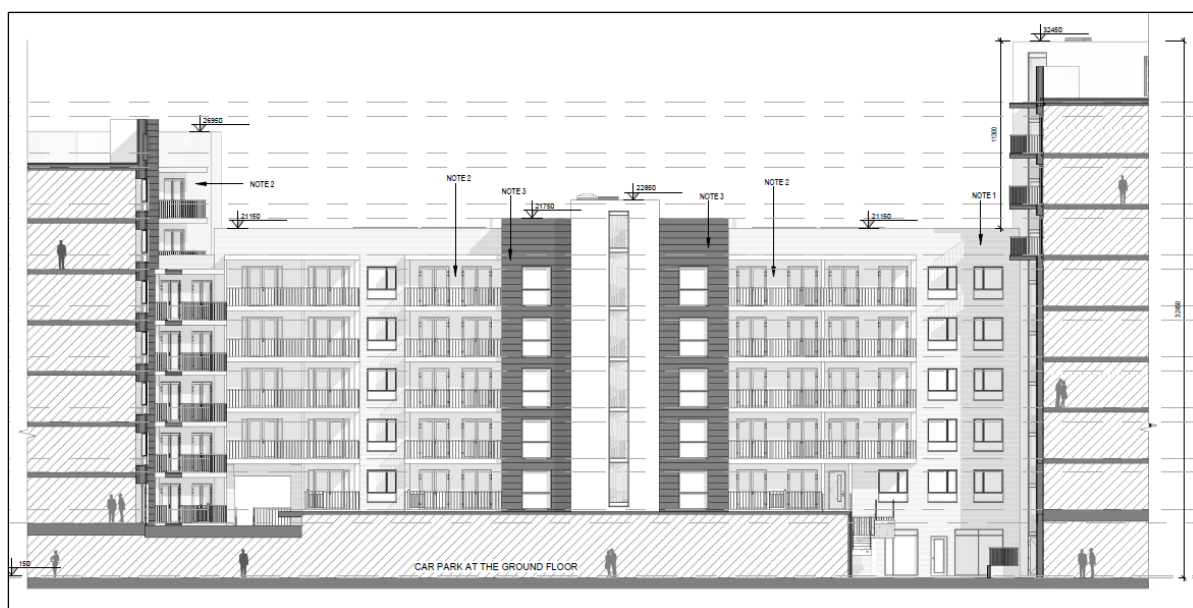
Courtyard elevation of proposed amended development under ABP Ref. ABP-307177-20
